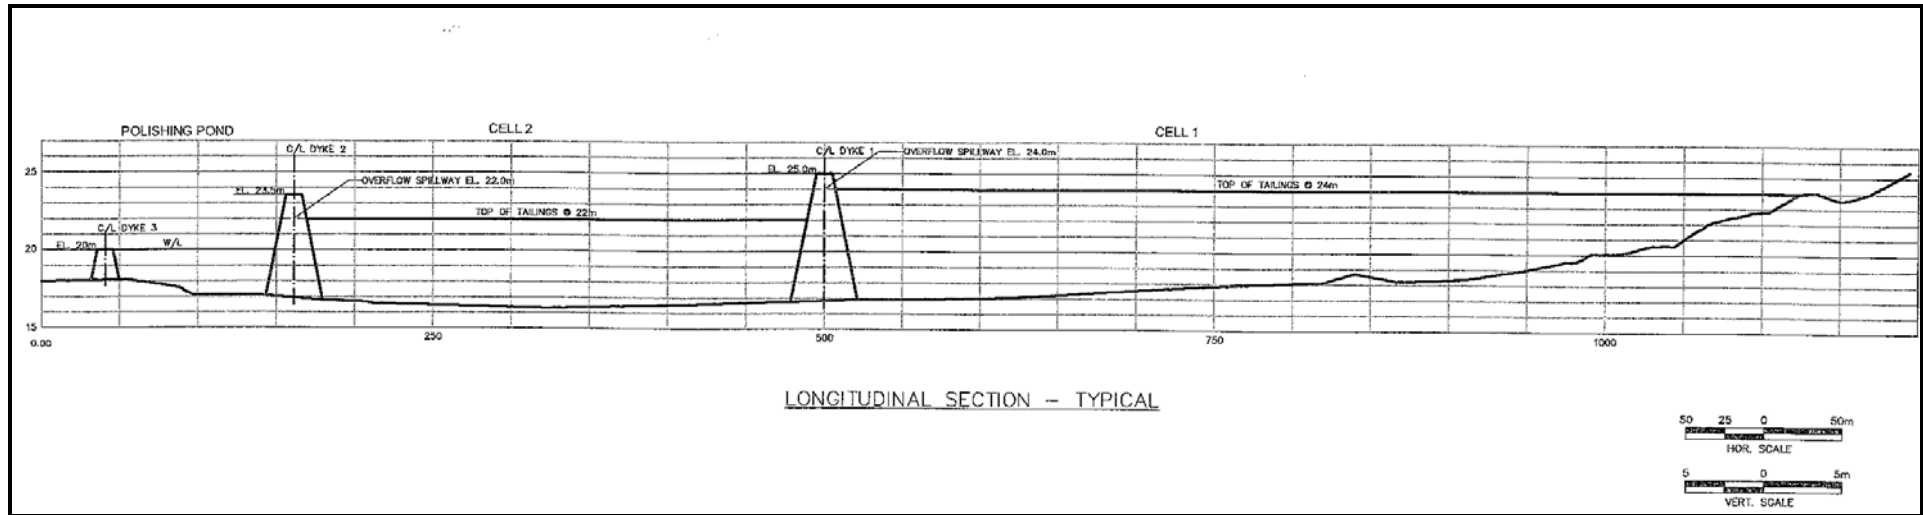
Shoal Cove Pond Tailings Management Facility - Dam Cross Section
